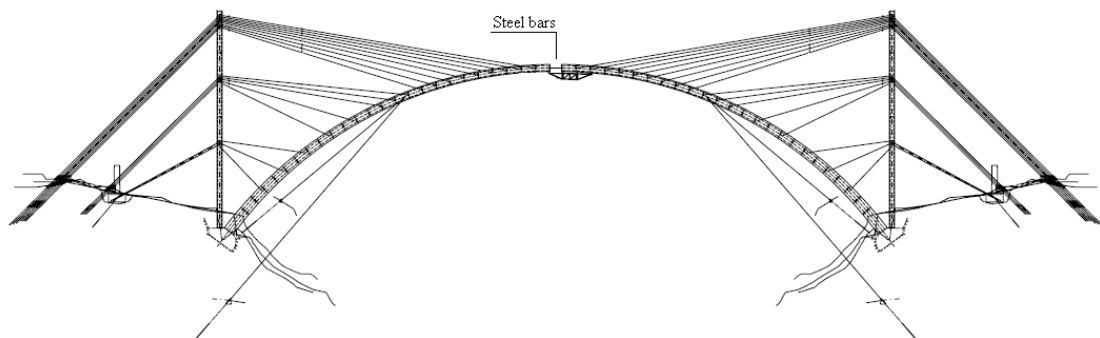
The cable-stayed arch divided in segments and with the steel bars connecting the arch halves. Adopted from Vägverket (2007)
